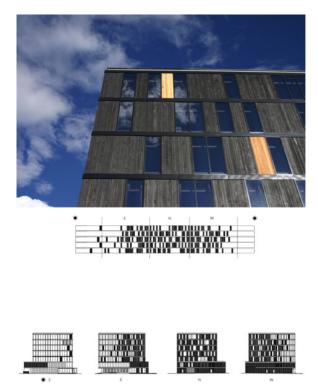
Charred and natural cedar panel façade elevations with glazing increasing from north to south.
